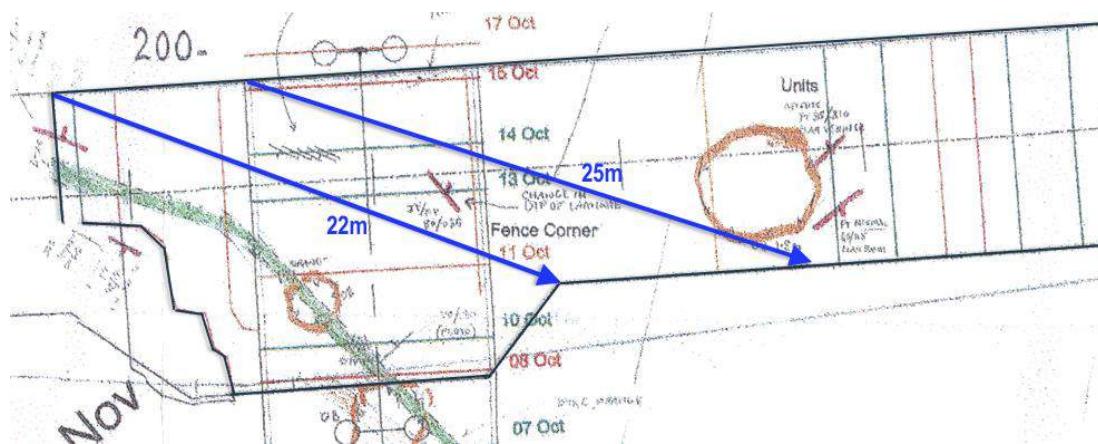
Effective spans of up to 22m for the collapsed T-shaped intersection compared to the 25m+ span for the stable L-shaped intersection formed by the up-drive excavation.
